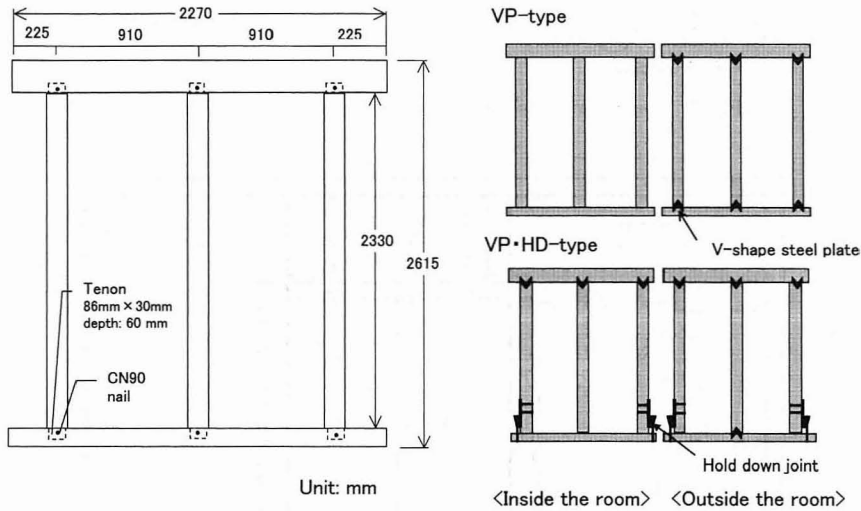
Geometry of the wood frame and two types of joint reinforcement.
